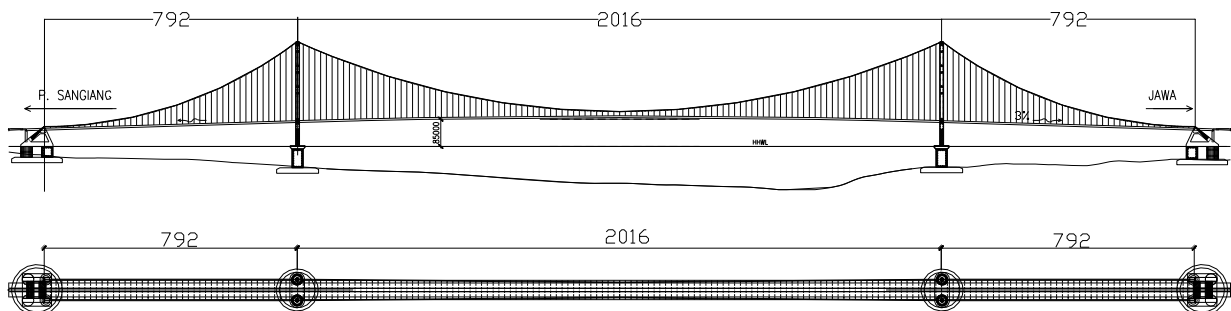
Longitudinal arrangement of Sunda Strait Bridge (Unit: m)
